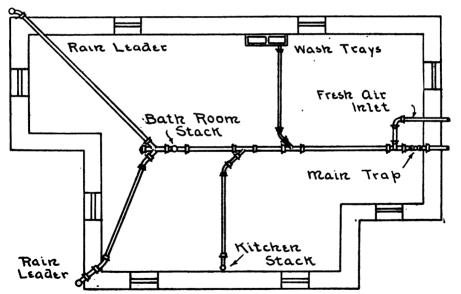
Showing Cellar Plan. Scale 1/8-Inch to 1 foot.
